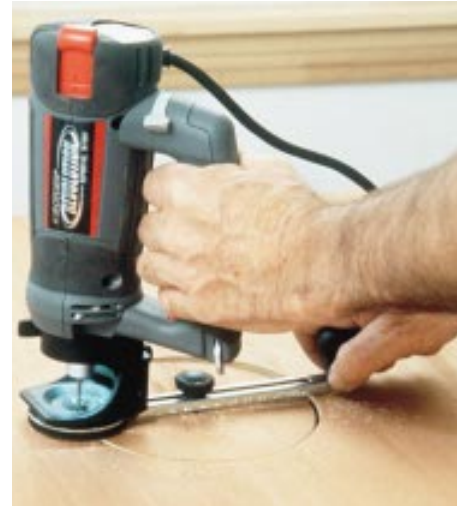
The hole cutting attachment made short work of exterior light fixture mounts and 6-inch openings for recessed lighting.
